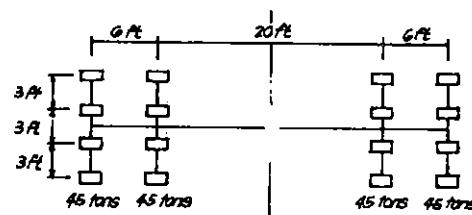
The wheel positions of the BS, HB loading in plan
